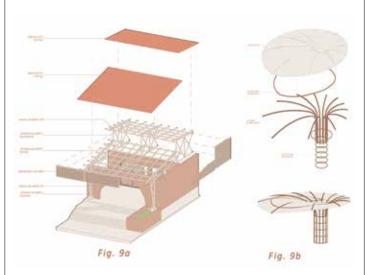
Construction System Fig. 9: Roof Construction Systems Fig.9a: Clay pot tile roof. Fig.9b: Tensile cloth canopy
